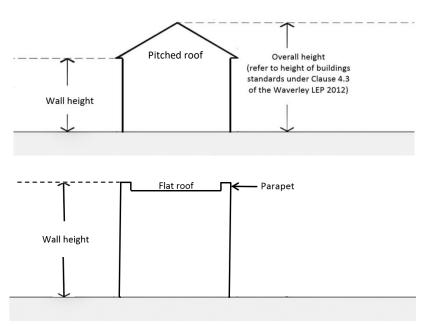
How to measure wall height for dwellings with pitched and flat roofs
